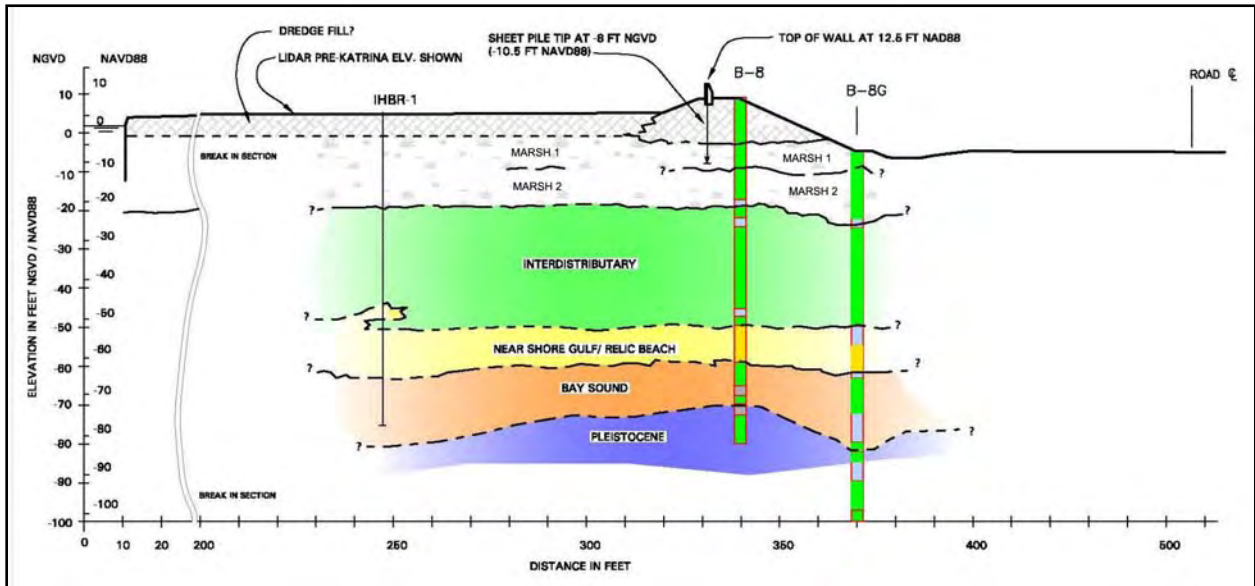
Profile of the North Breach at IHNC East bank, View Looking North
